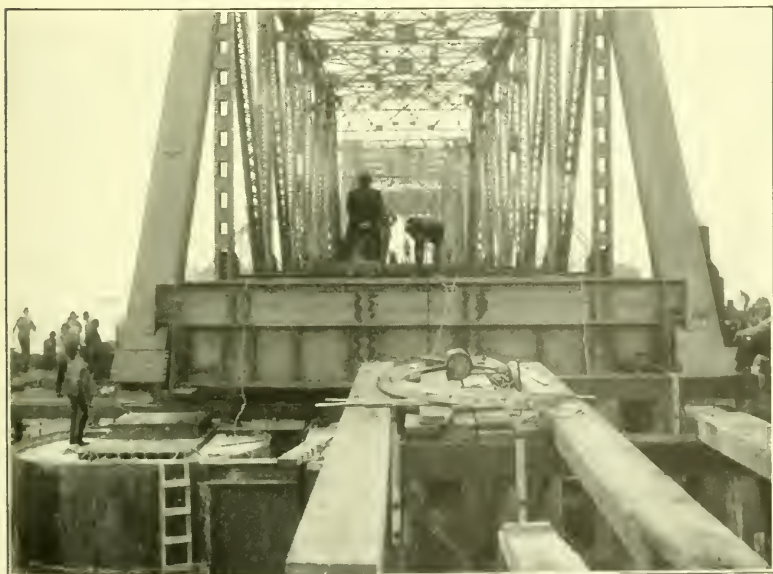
FIXED END OF SPAN 1, DUMBARTON POINT BRIDGE.
